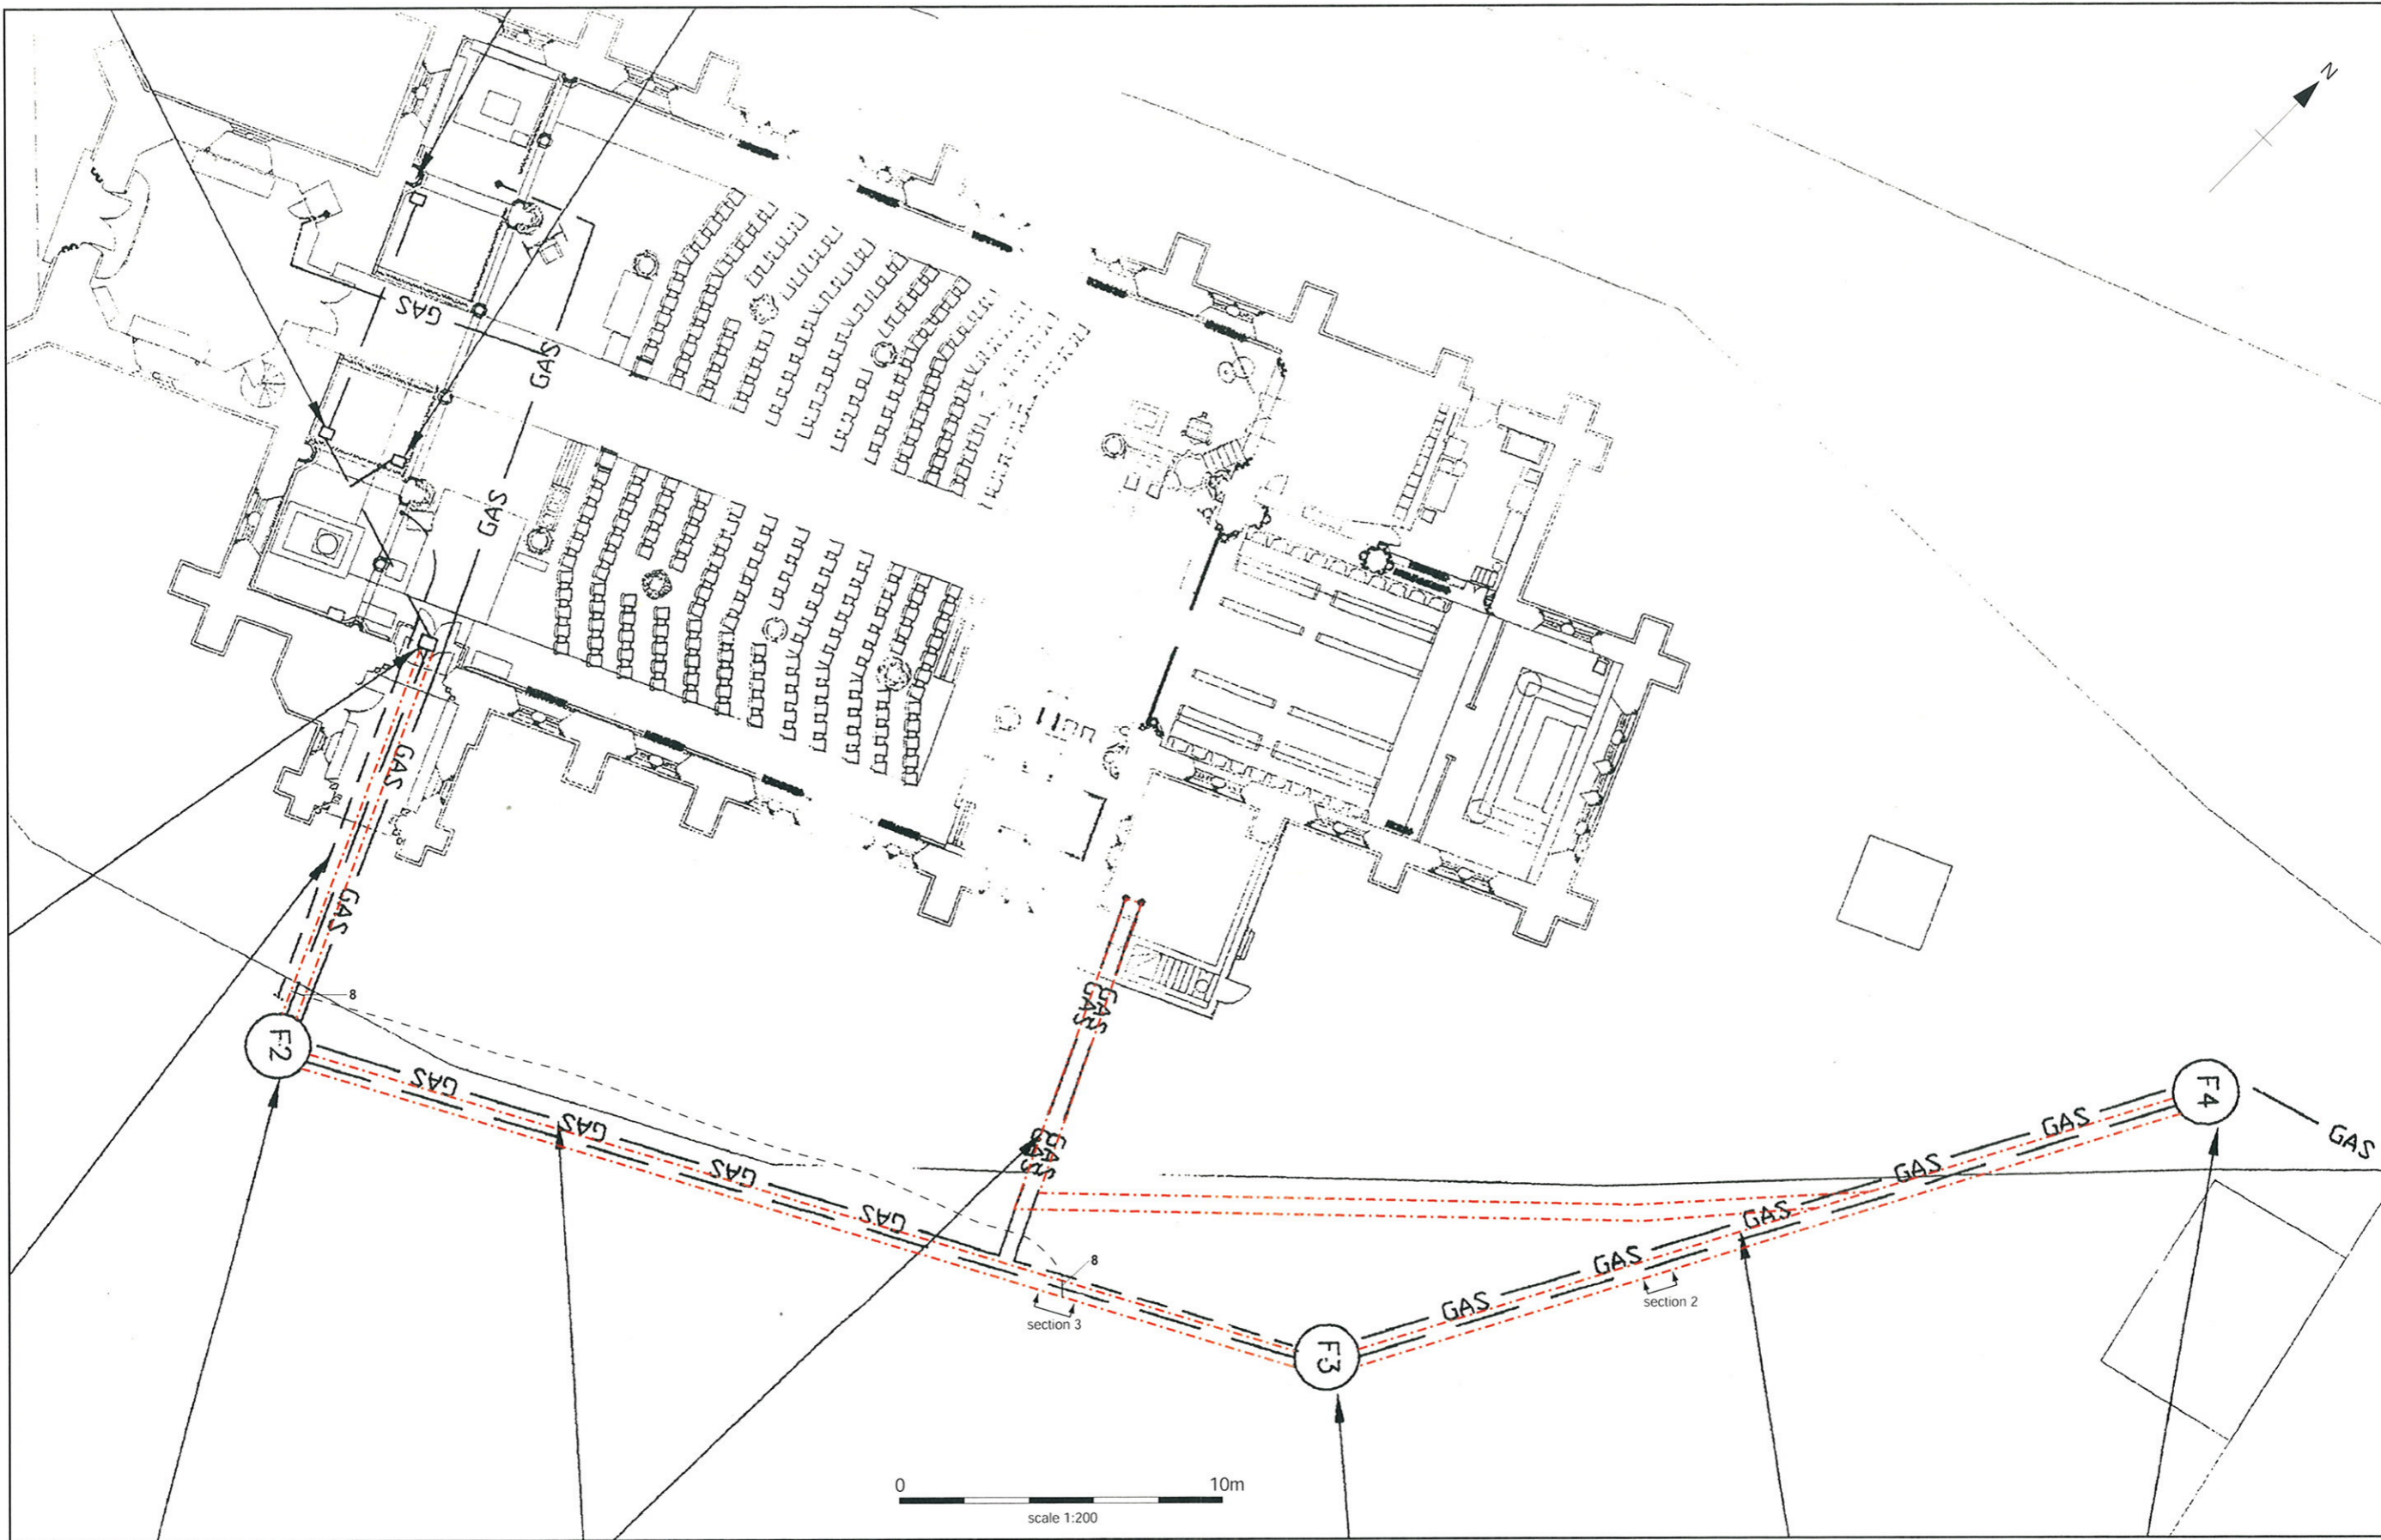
Plan of Service Trenches with Location of Sections 2 and 3
